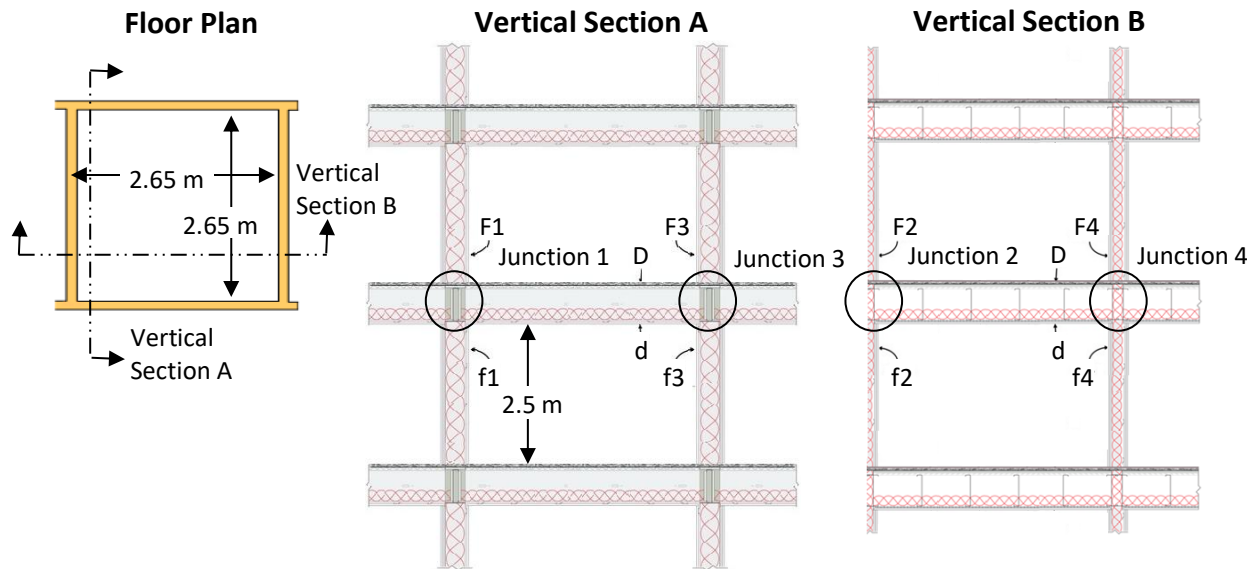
Junctions between the lightweight steel framed walls and floors for the example
